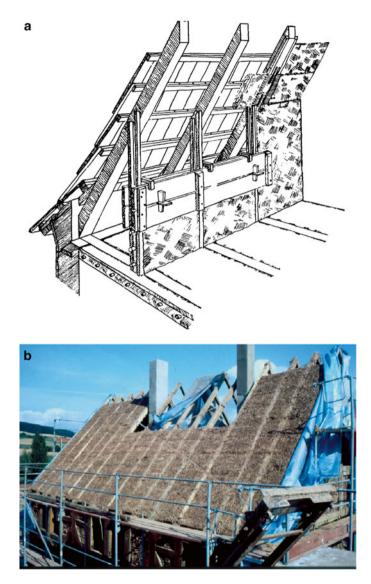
Roof and attic finishing using light clay. (a) Roof insulation using inserted clay panels, partition wall made of timber framing with a light straw-clay infill. (b) Roof insulation with 5-cm-thick reed panels and a light straw-clay loose fill on top
